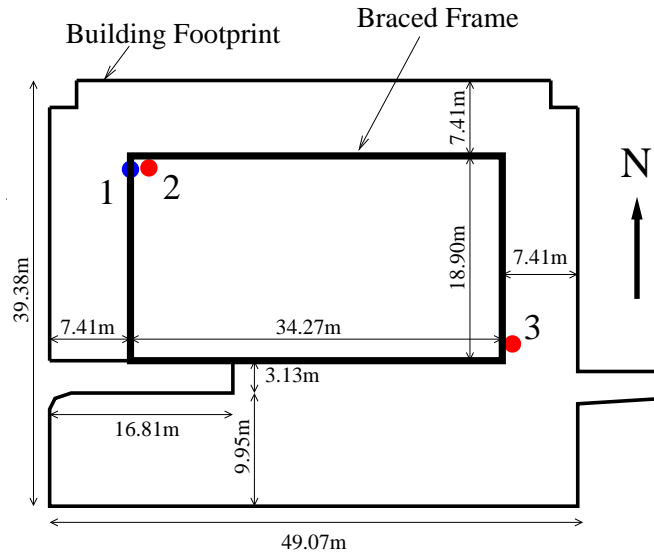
Broad Center — Schematic plan view showing placement of strong motion sensors. 1 is on First floor; 2 and 3 are located on the roof.
